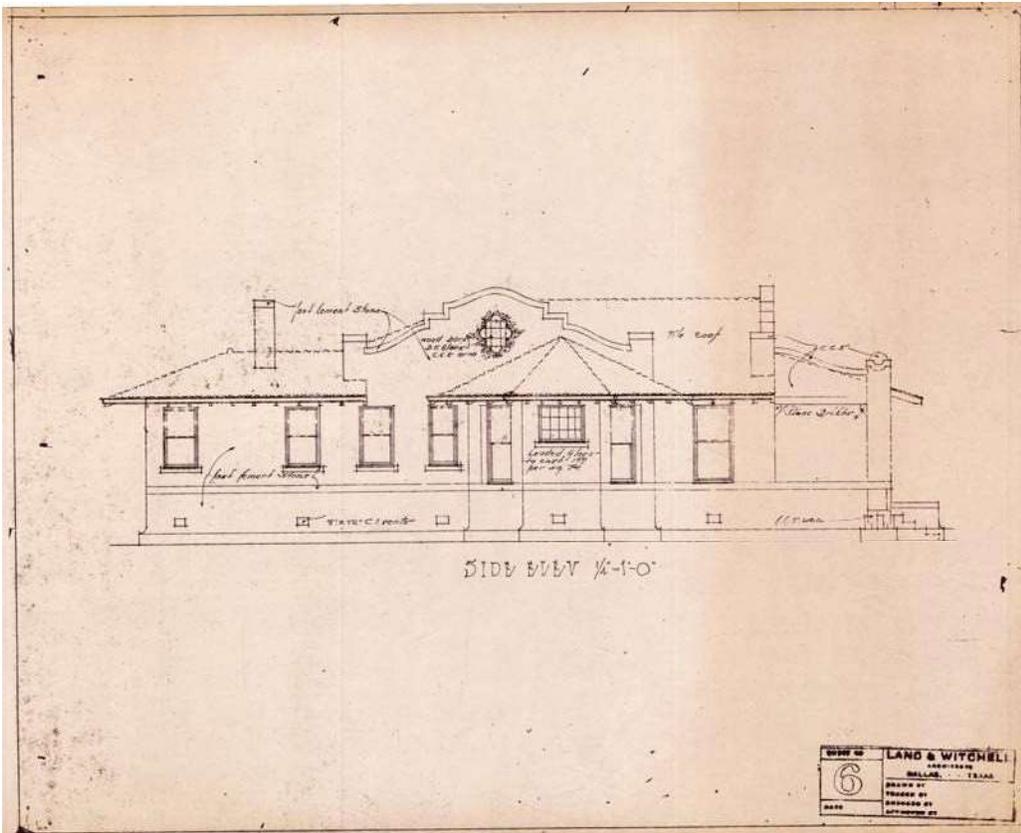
Original Lang and Witchell Side (Southwest) Elevation – Sheet 6
